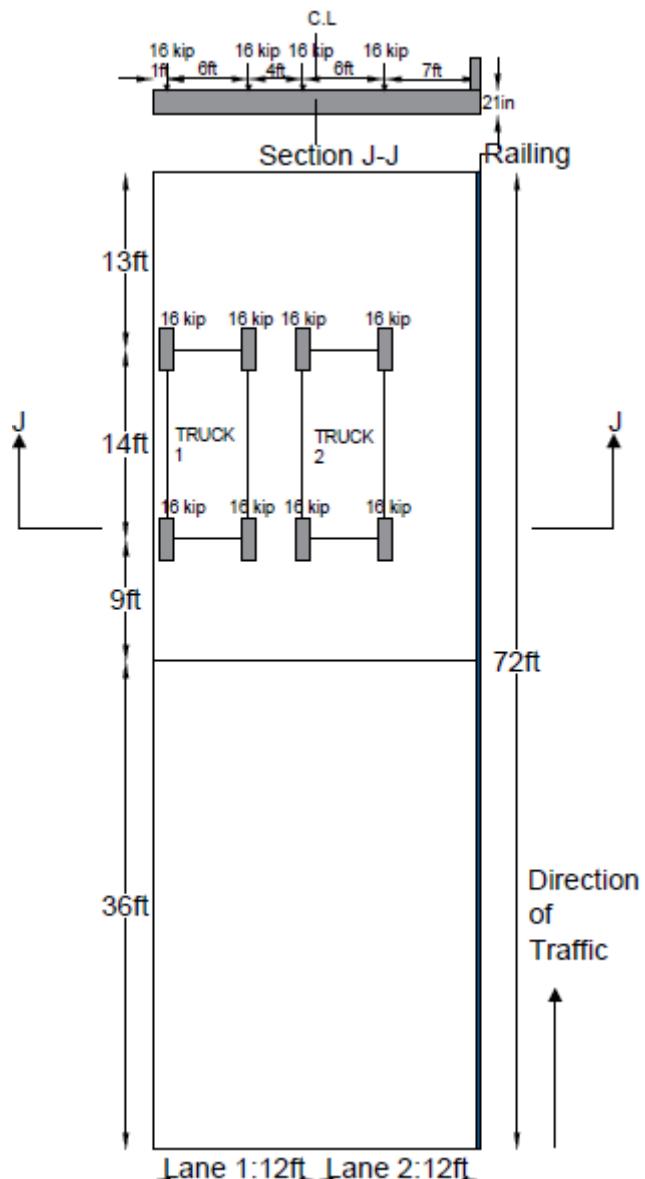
Typical Cross-Section and Plan of a Two-Lane 36ft straight Bridge with One Railing(Left) under Edge Loading (Negative moment).
